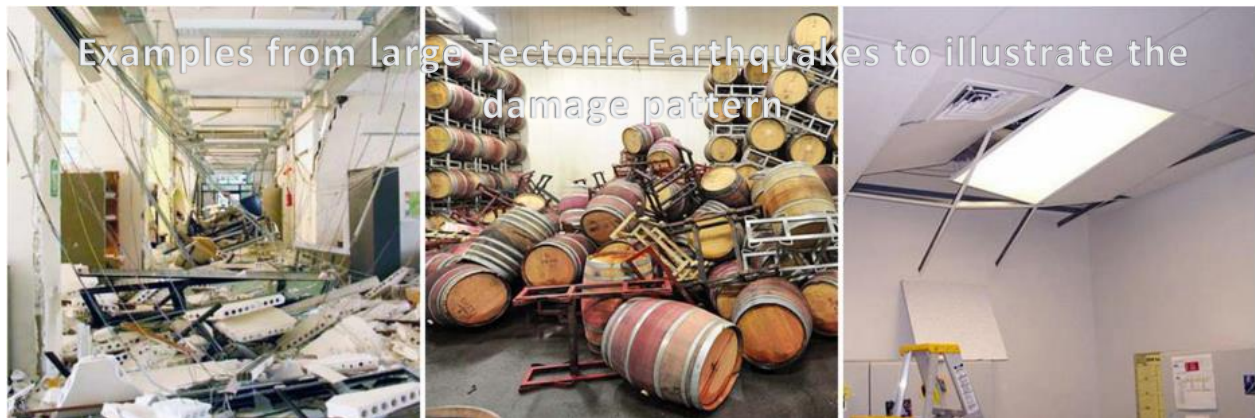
Examples of damage within buildings, due to the failure of non-structural elements. These examples are from large tectonic earthquakes, but illustrate to possible damage patterns.
